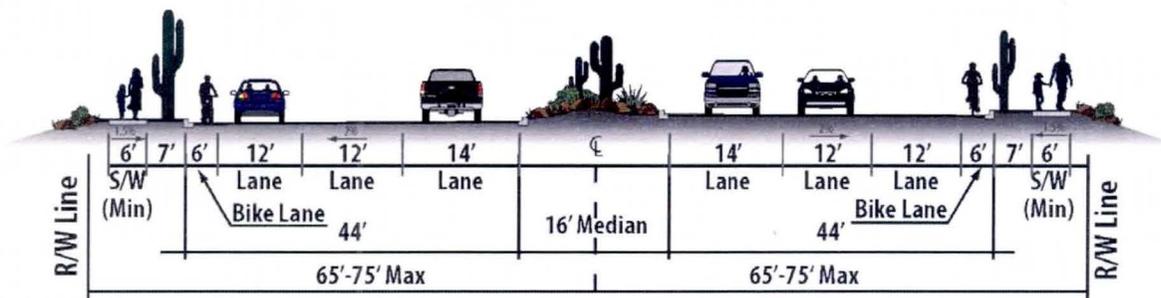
Ultimate Roadway Cross Section – Southern Avenue to Germann Road
